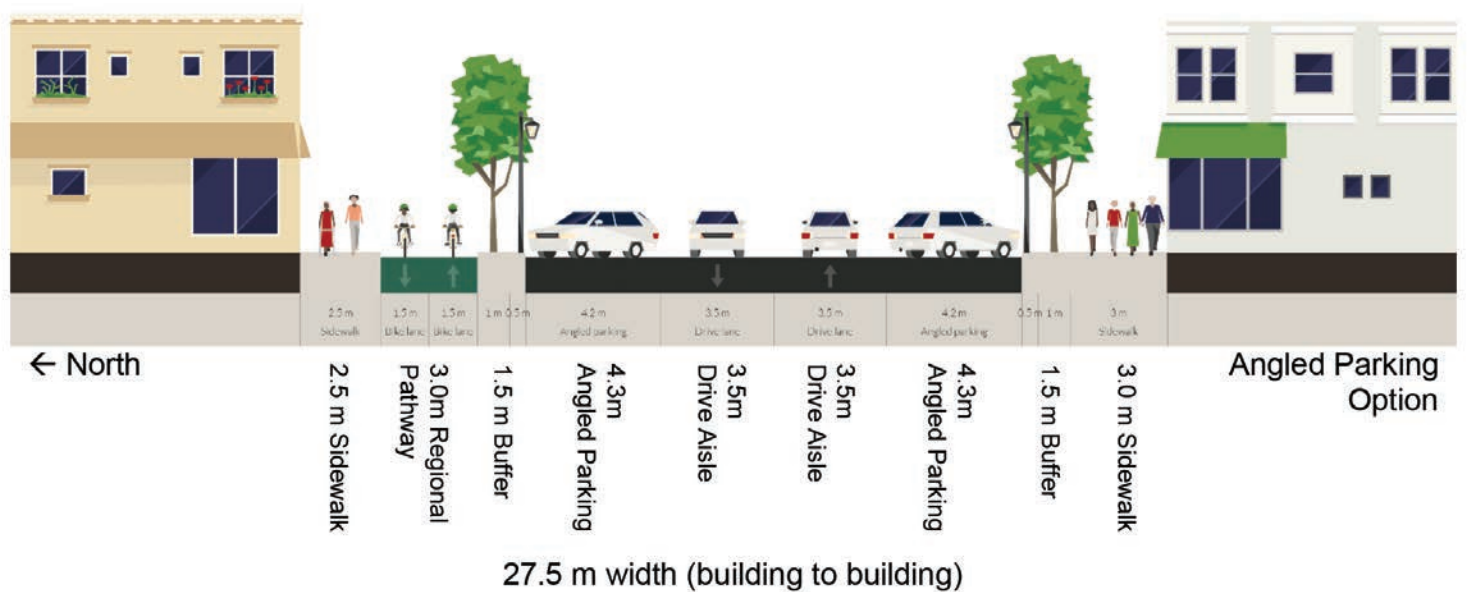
Alternative Conceptual High Street Cross-Section represents the internal walkable street that transects the Plan Area east-west. Although this option is not illustrated in the Concept Plan, parallel parking may be considered during detailed design. Should parallel parking be pursued, the cross-section will continue to meet the requirements of the Land Use Bylaw and Town design specifications.
